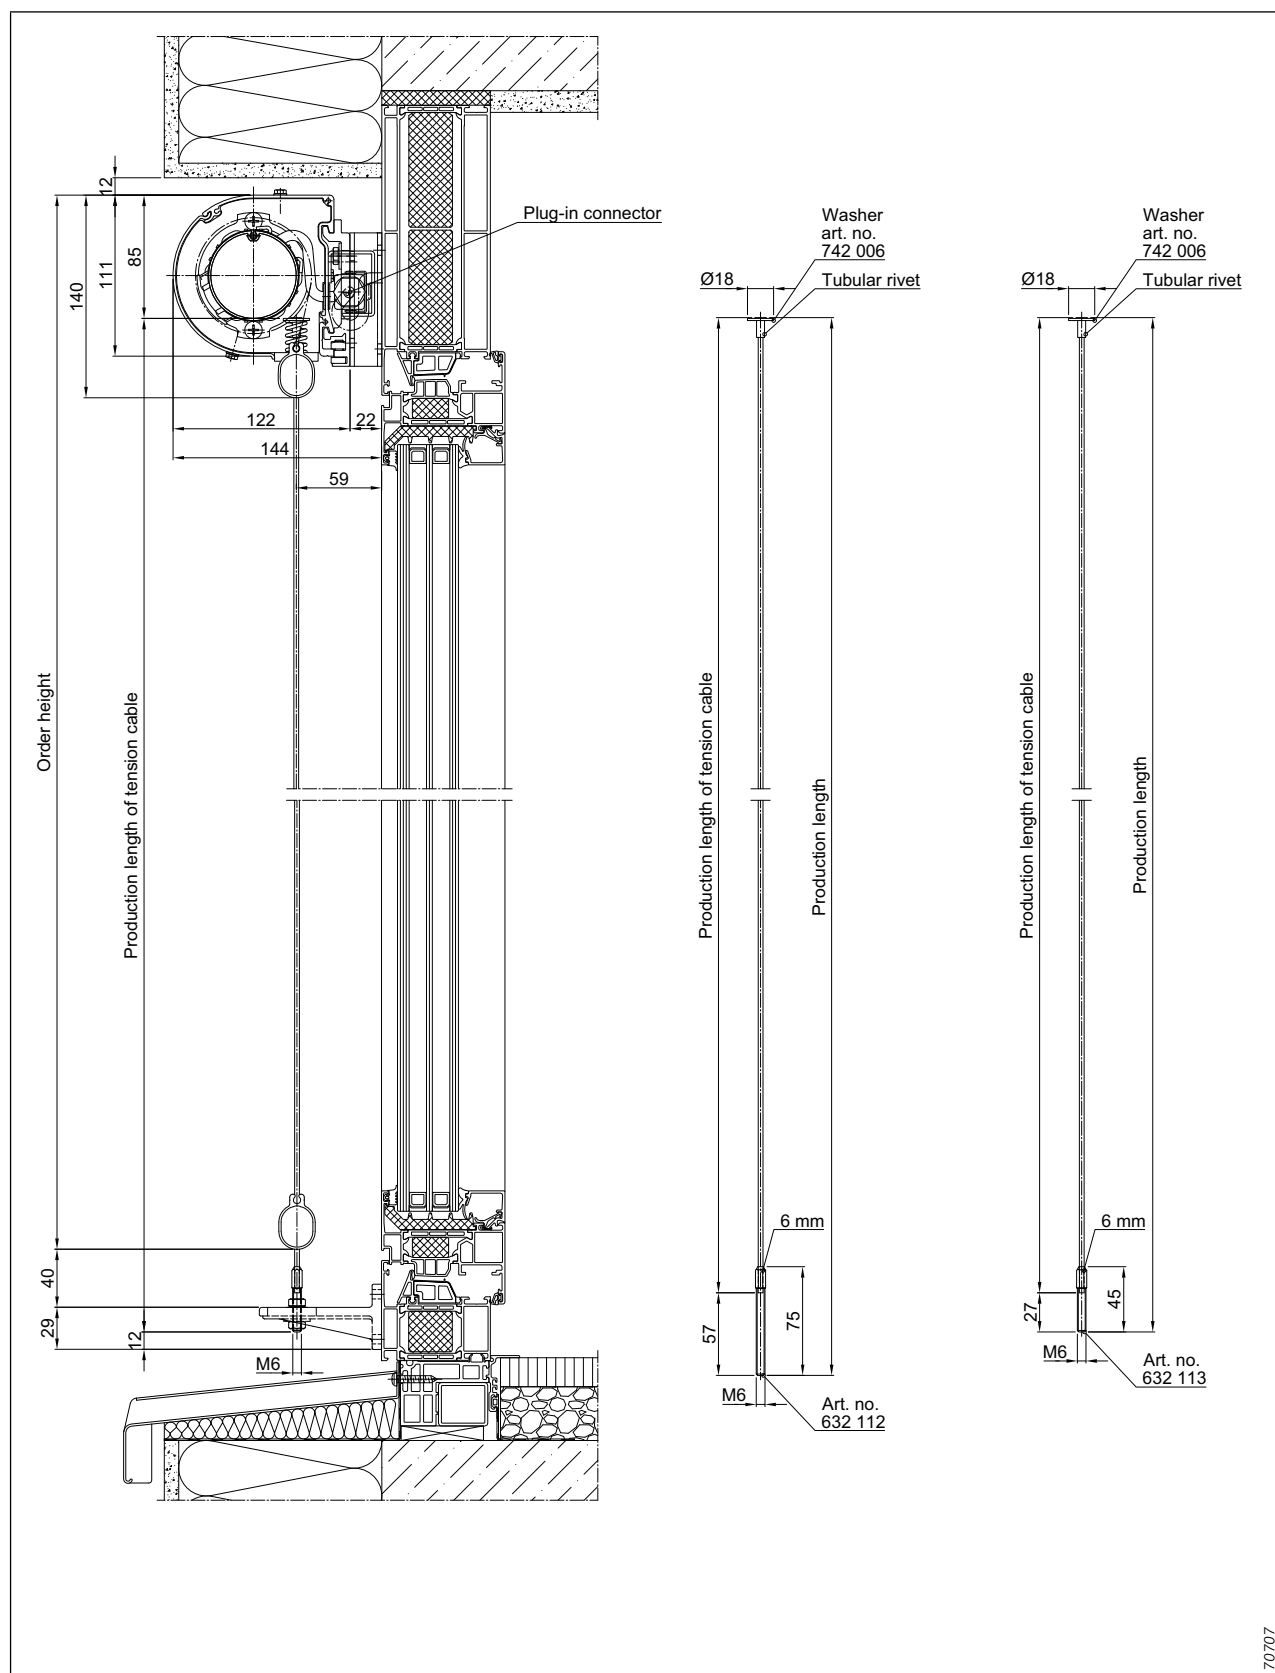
Vertical awning 499 with threaded end piece, motor drive
